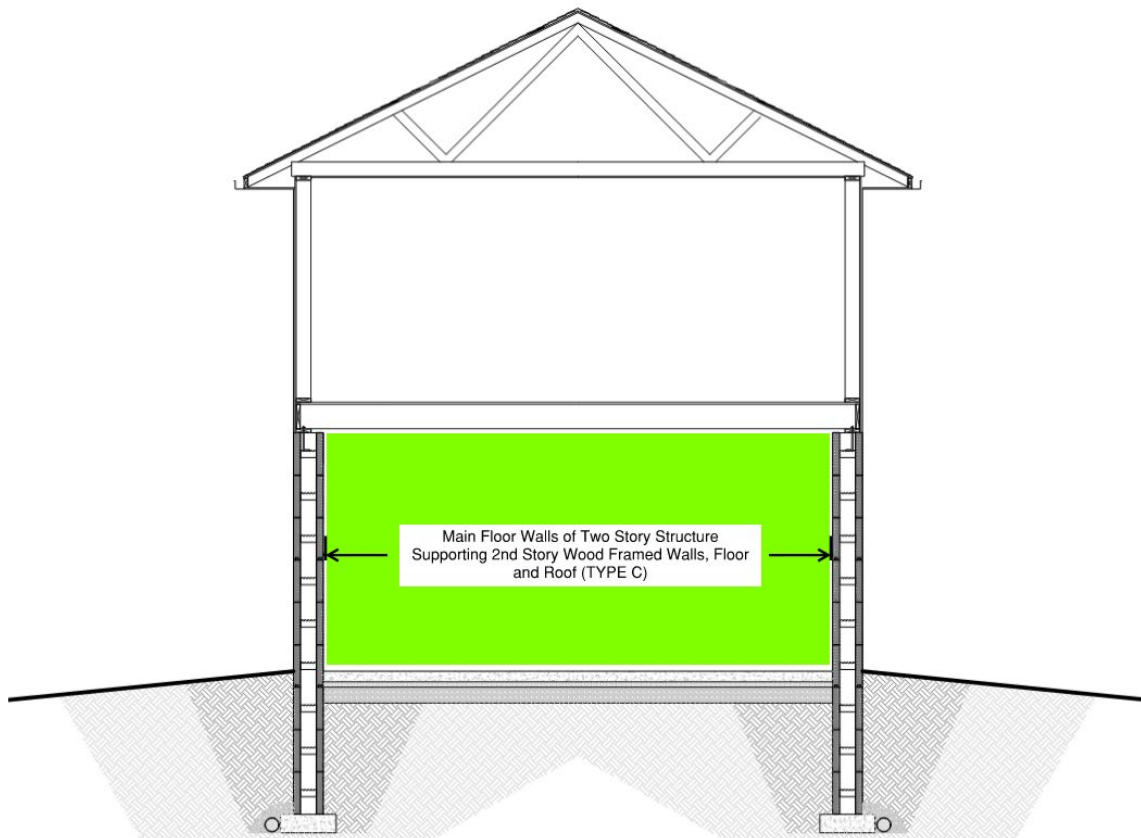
Wall Configurations in a Building Without Walkout Basement
